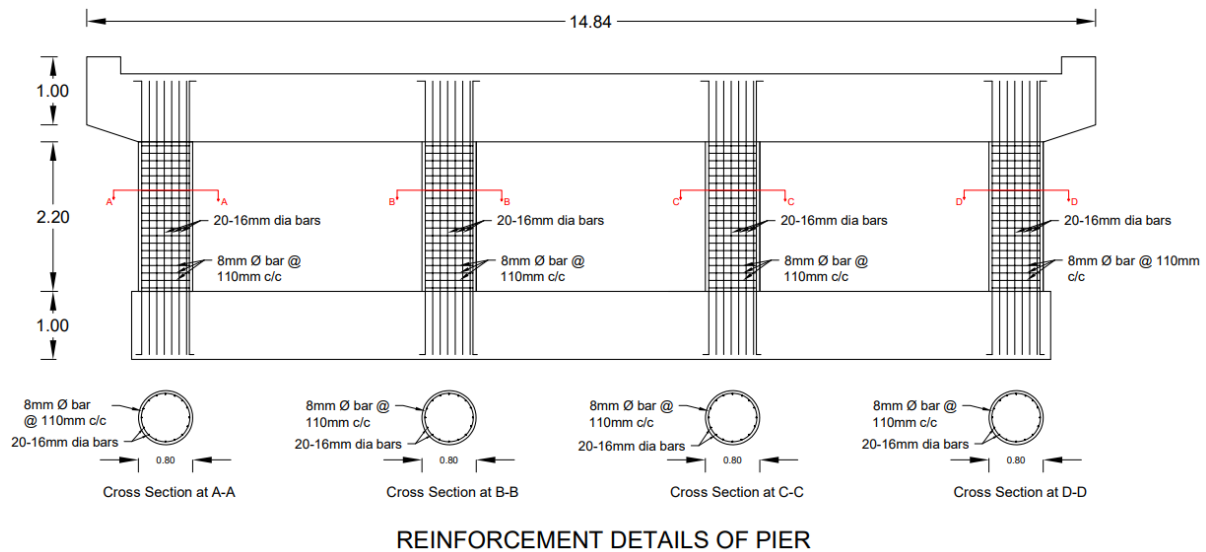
Reinforcement Details of Pier (All dimensions are in meters)
